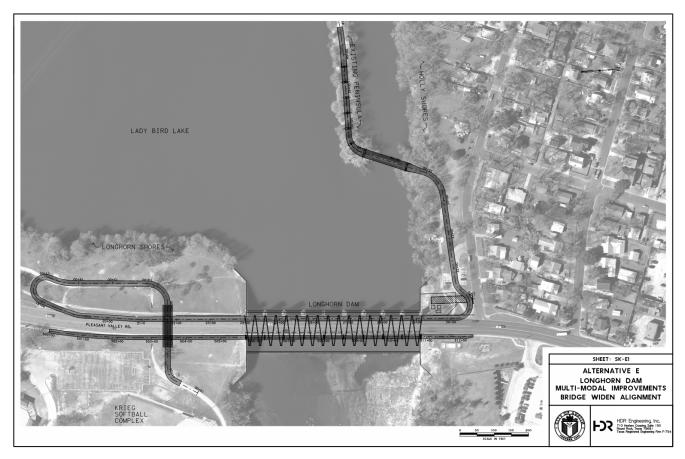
Existing Bridge Widening Alternative (Alt E)
